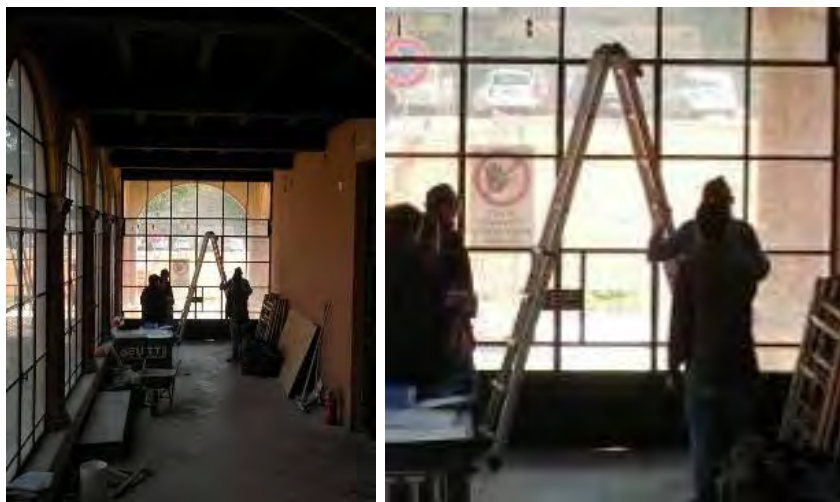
\_Main entrance door in low airtight conditions, as visible from the passing light at the bottom
